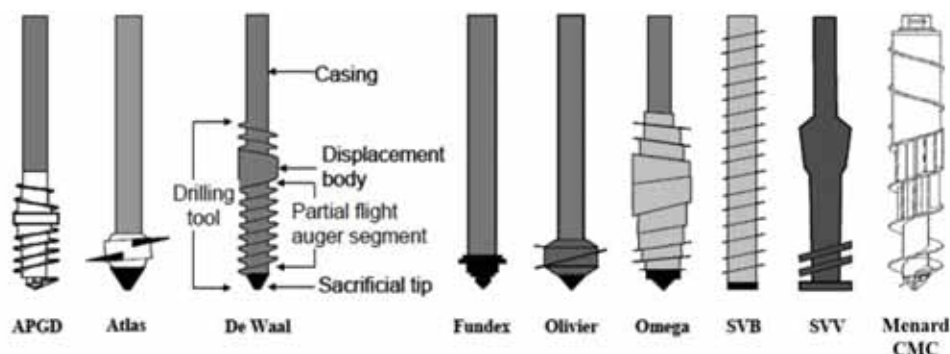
Schematic of different types of drilling tools for concrete DD piles (mod. after Basu and Prezzi, 2009)
